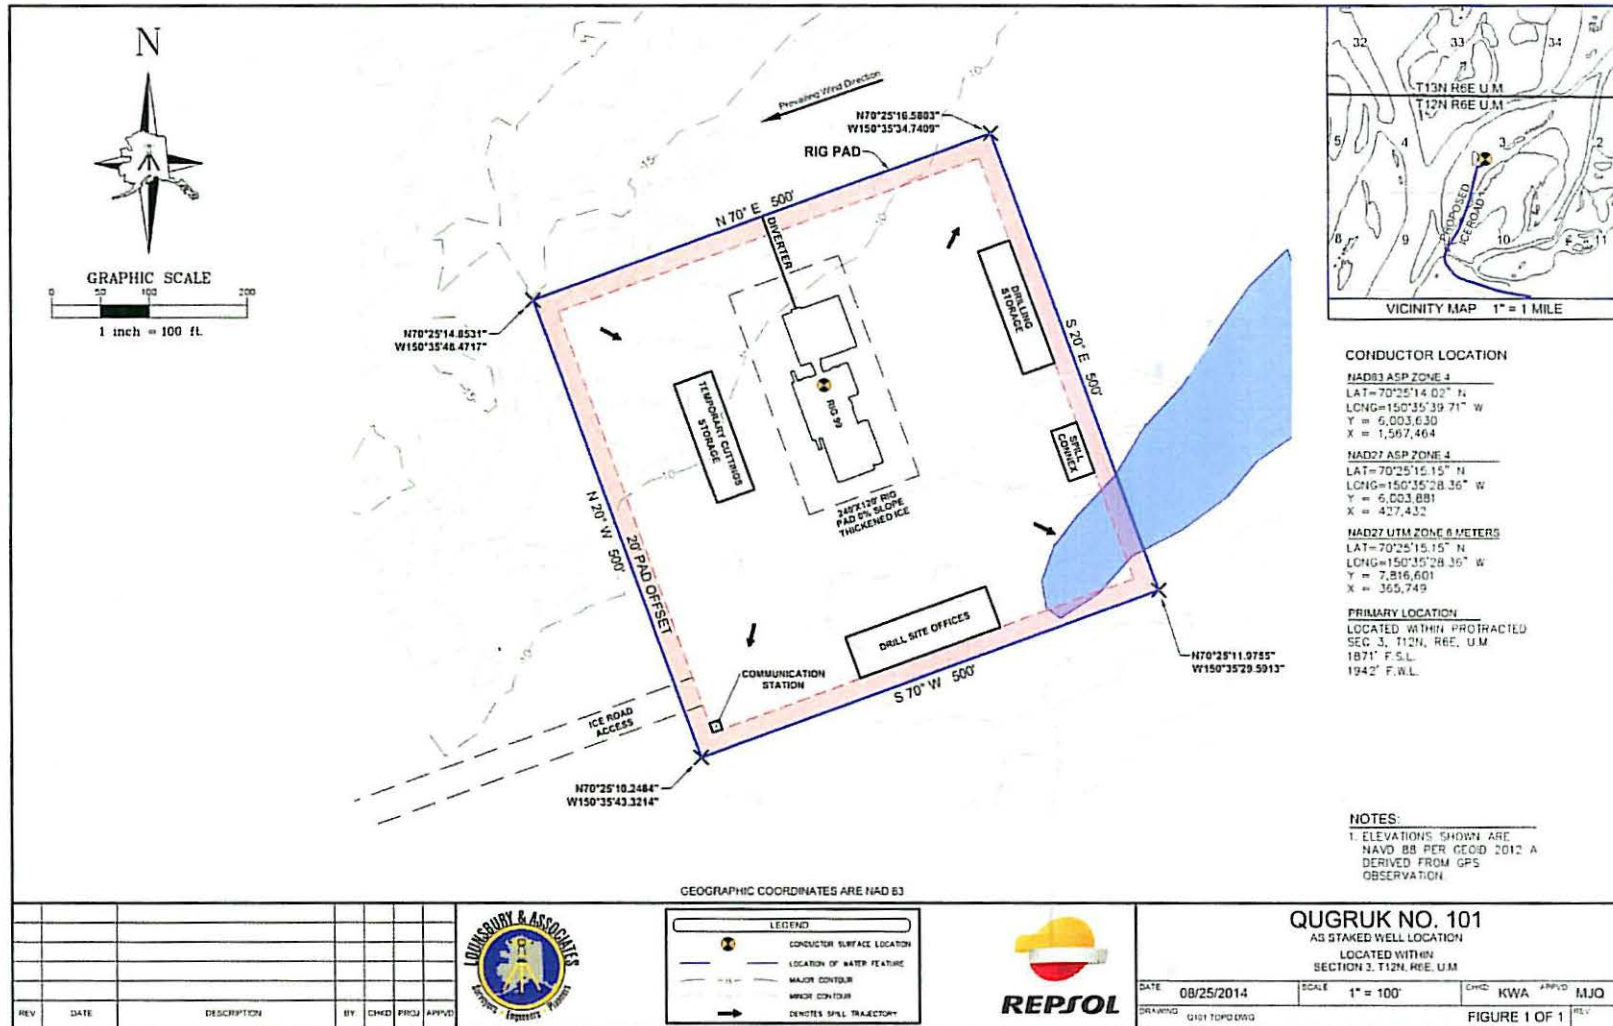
Qugruk No. 301 Drill Site Pad Layout
